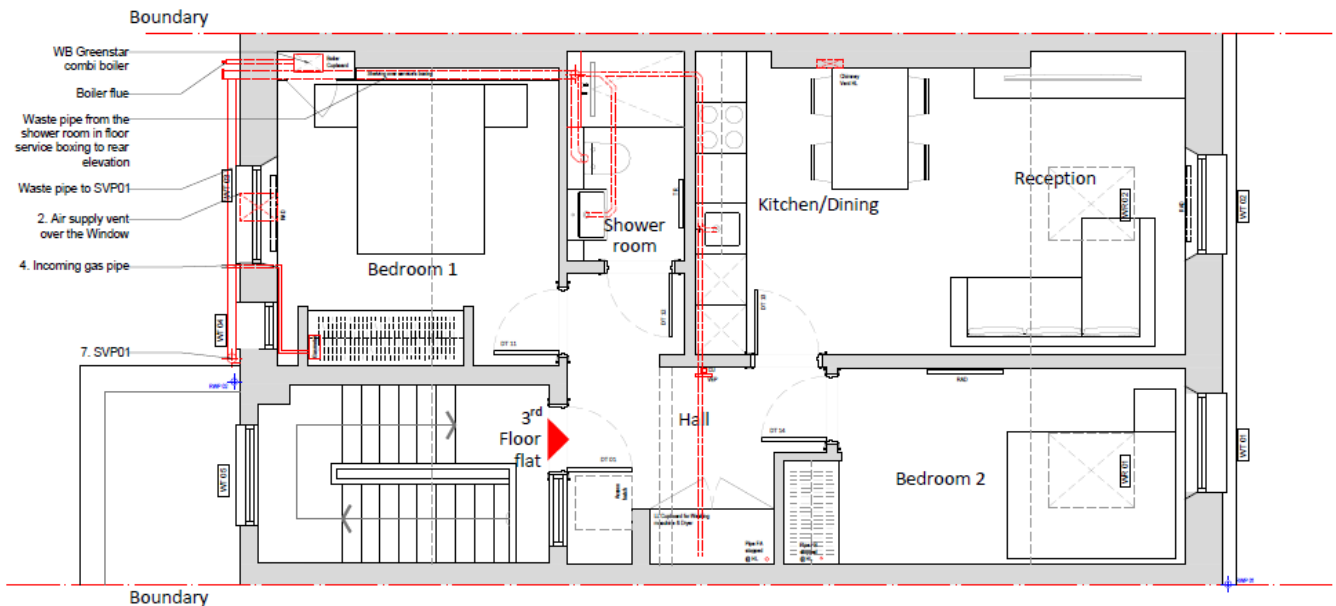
Extract from drawing 8388/ 15 Proposed Plan
